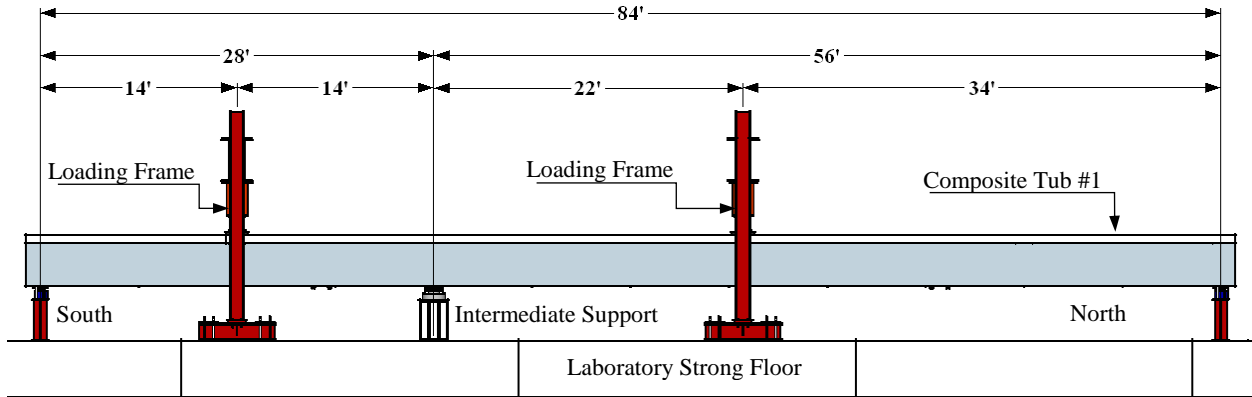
Continuous Girder Test Setup - Tub #1
